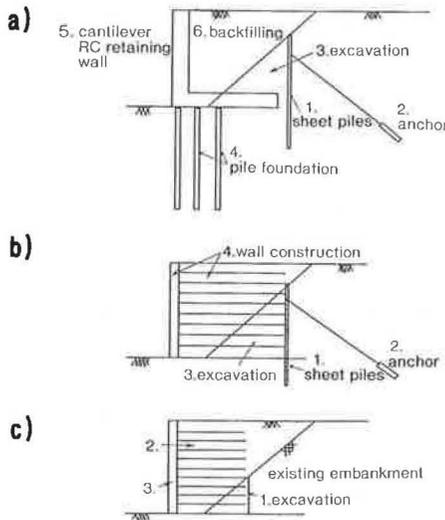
Comparison of different retaining wall construction procedures for reconstructing an existing slope; a) a conventional RC cantilever RW, b) a reinforced soil retaining wall with relatively long reinforcement, and c) a reinforced soil retaining wall with relatively short reinforcement
